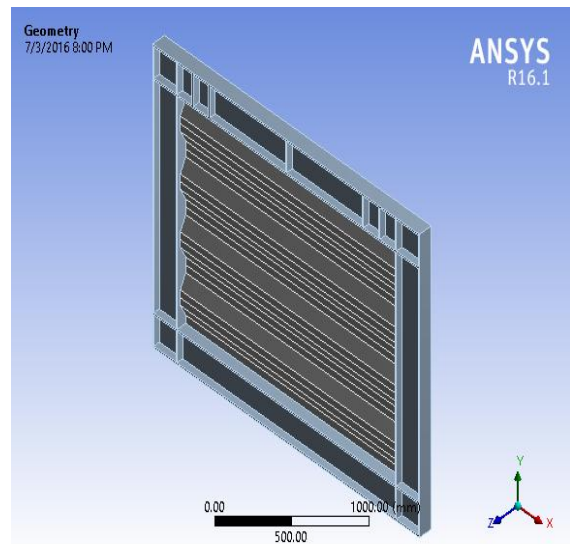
Trapezoidal corrugated steel plate shear wall with  $0^\circ$  corrugation angle
